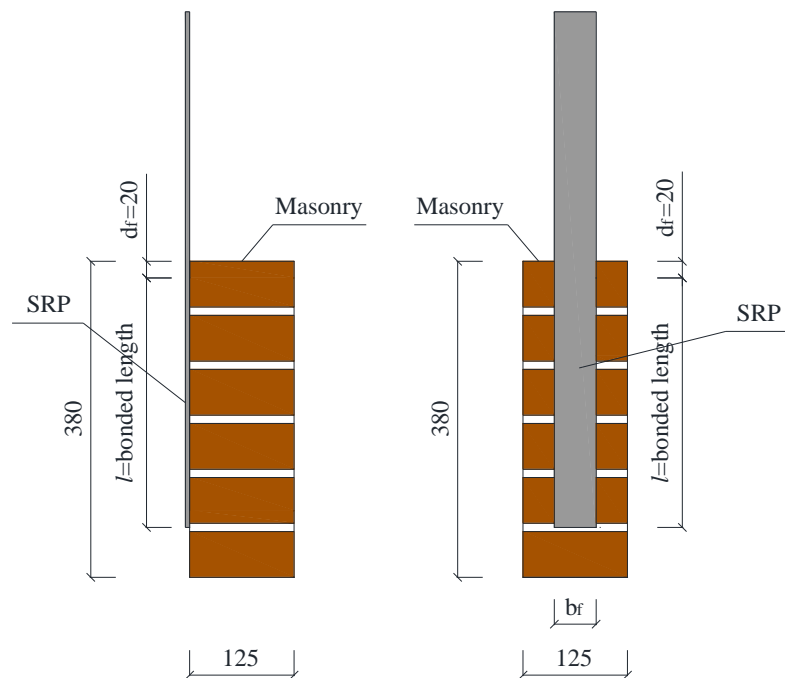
Specimen Dimensions and Details of Bonded SRP system (masonry specimens).
